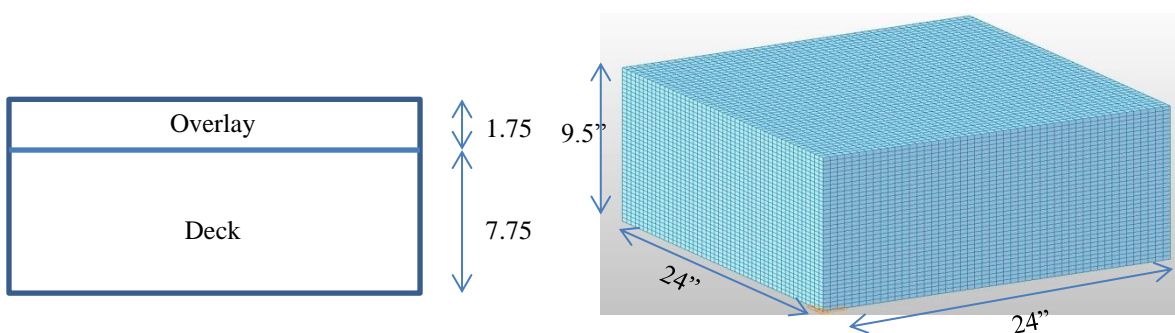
Section of the deck and overlay in a slab and the finite element model of the slab
